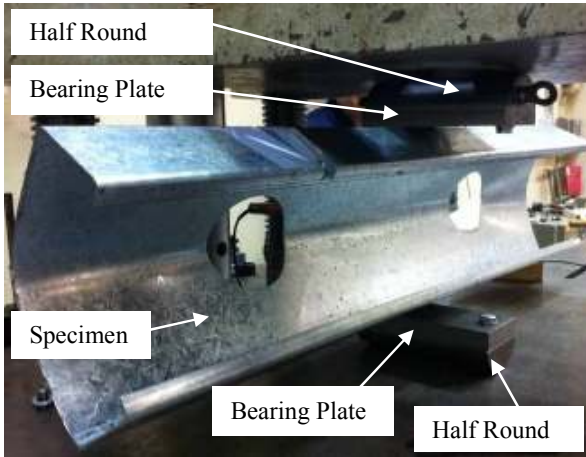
Schematic view of Interior-Two-Flange loading test arrangement (Front view)
